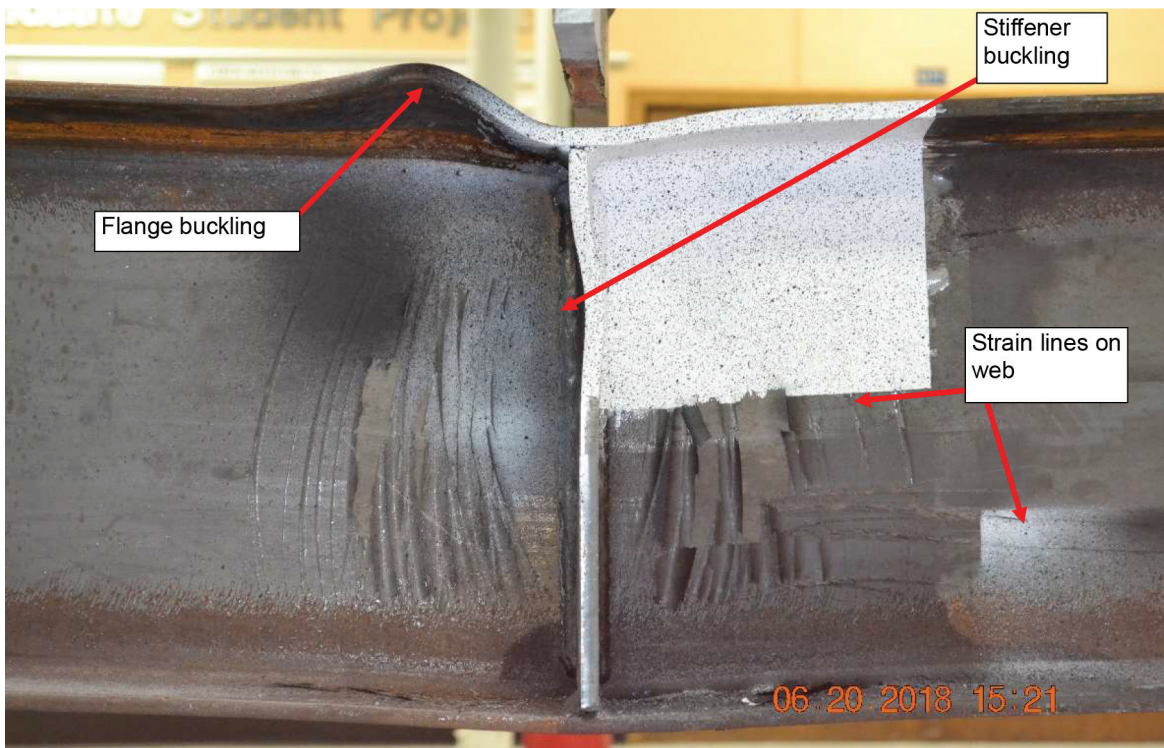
Close-up view of front side of W12x26 SC-E0 after testing.
